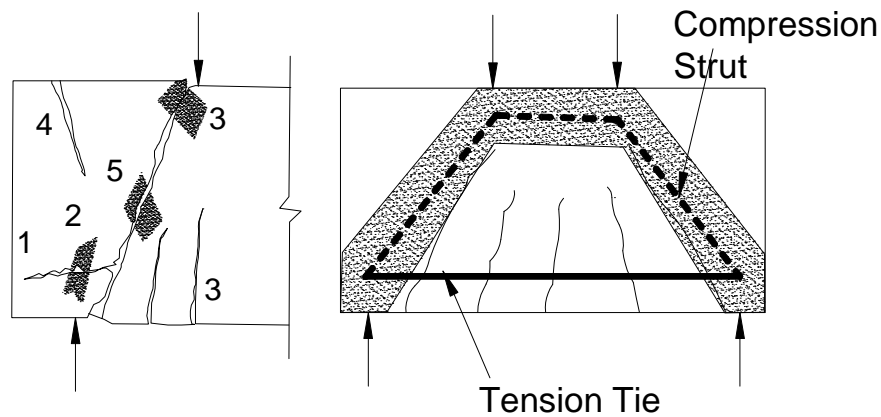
5 The different modes of failures recorded for deep beams with (a/d) from 0.5 to 2. Modified from Joint ASCE-ACI Task Committee 426, 1973. The types of failure are: 1-Anchorage failure; 2- Bearing failure; 3- flexural failure; and 4,5-failure of compression strut.
